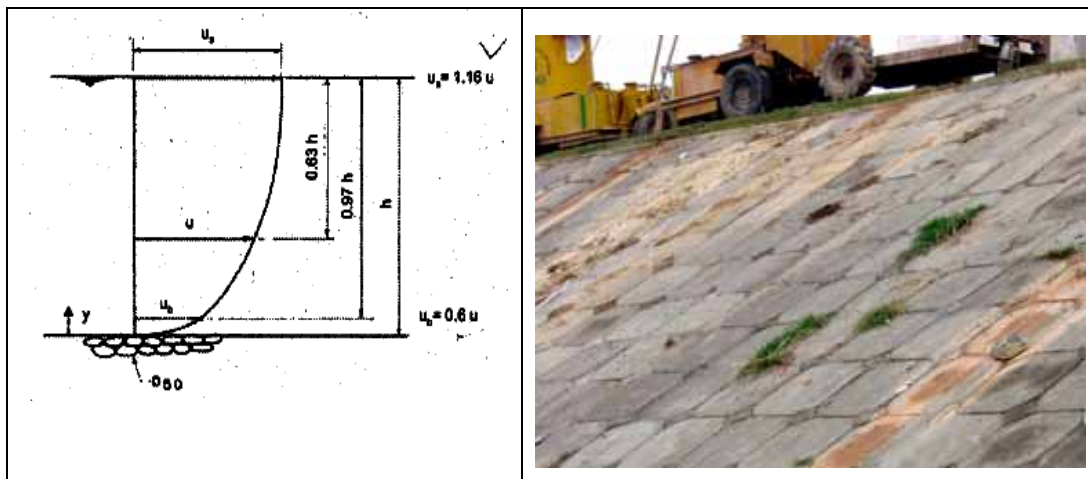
Cube-shaped concrete block revetment (hand placed in a single layer).
